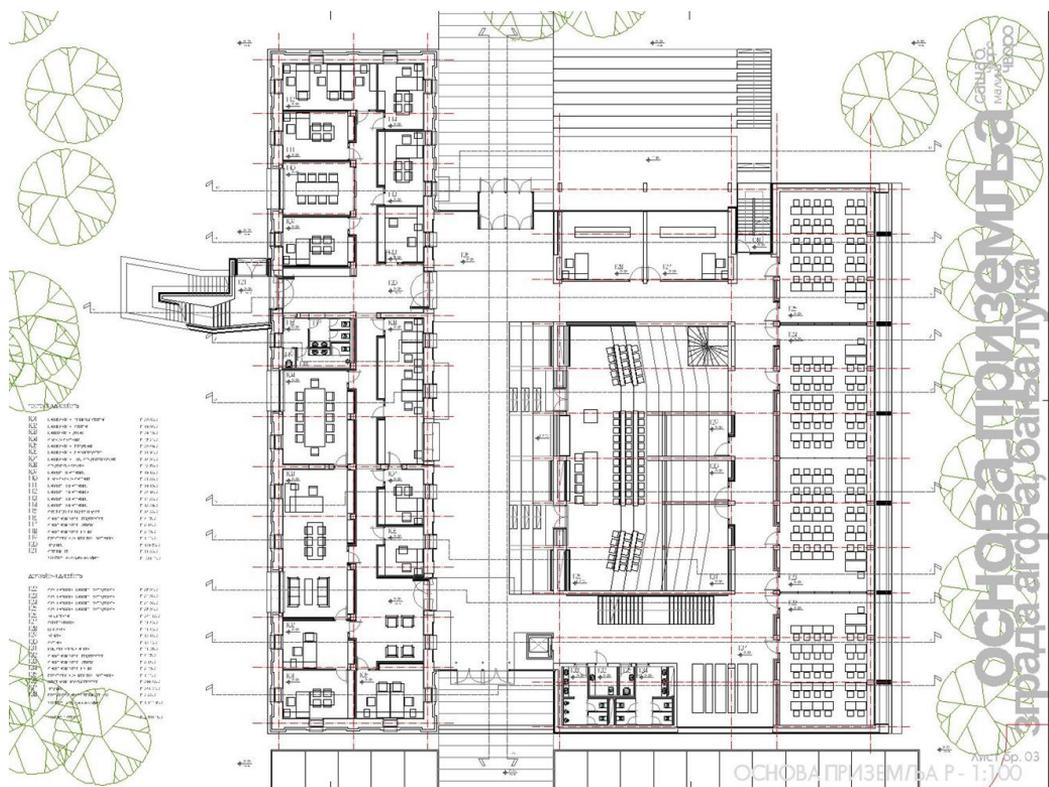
plan of building , authors Saša Čvoro and Malina Čvoro
